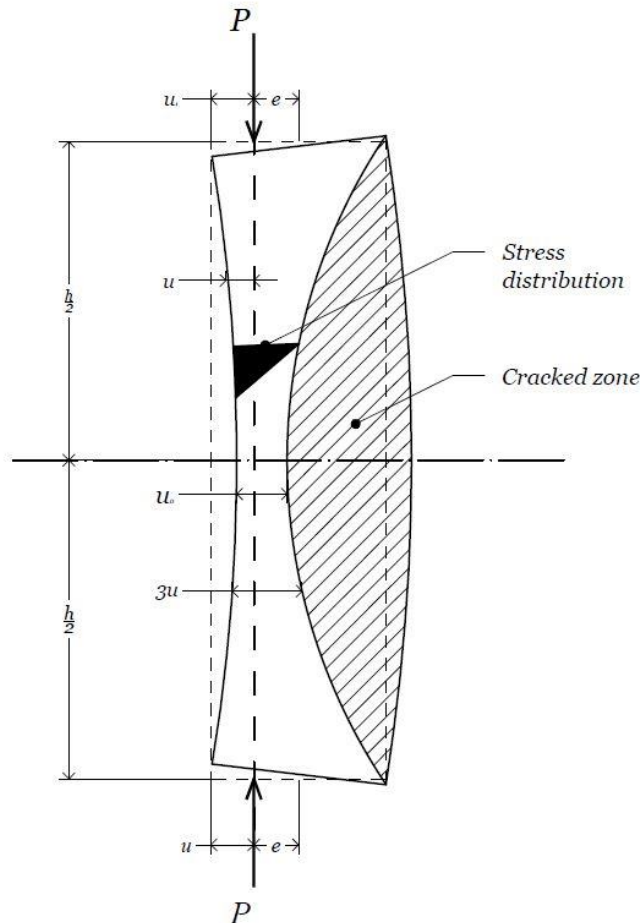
Cracked compressed beam-column with eccentric load
